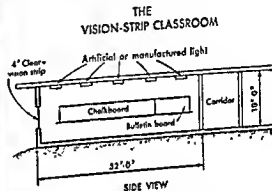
Some details of a vision-strip classroom. Light-control blinds, shades, or drapes can be easily and inexpensively installed to permit easy adjustment of room light. Large wall areas are available for chalkboards and bulletin boards.
